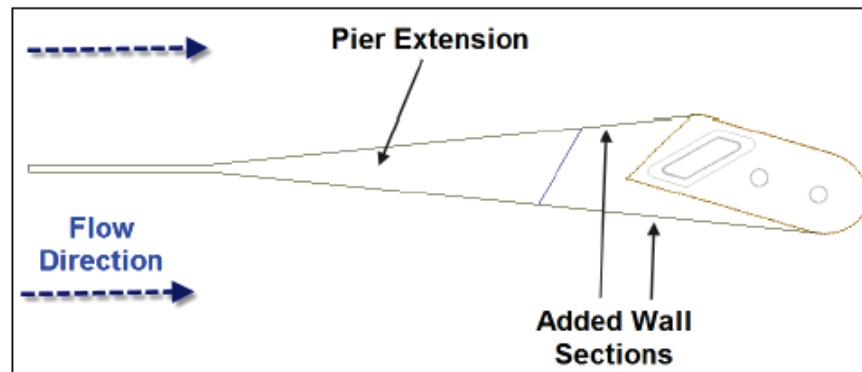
Proposed bridge pier set protection design, with 0 degree skew, for the Burlington Northern Santa Fe railroad bridge pier set evaluated in the physical model.
